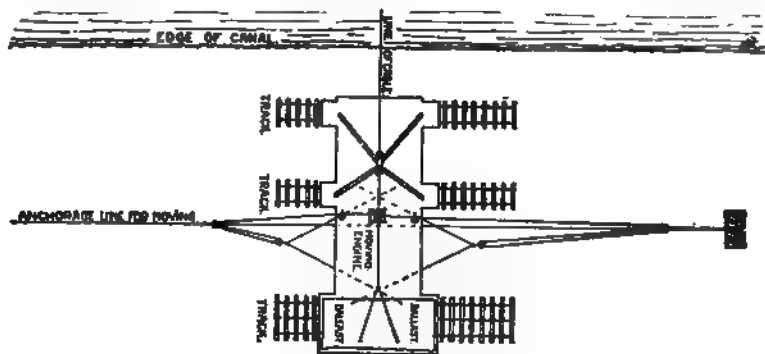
Showing Lay-out of Cableway as used on the Chicago Drainage Canal.
